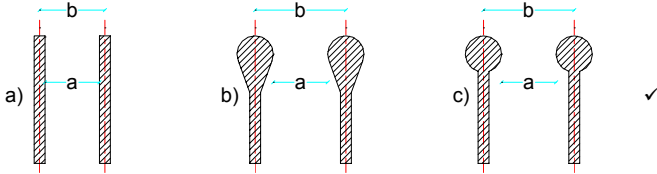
Some typical profile of racks for Tyrolean intake: a) to be avoided; b) better; c) the best
